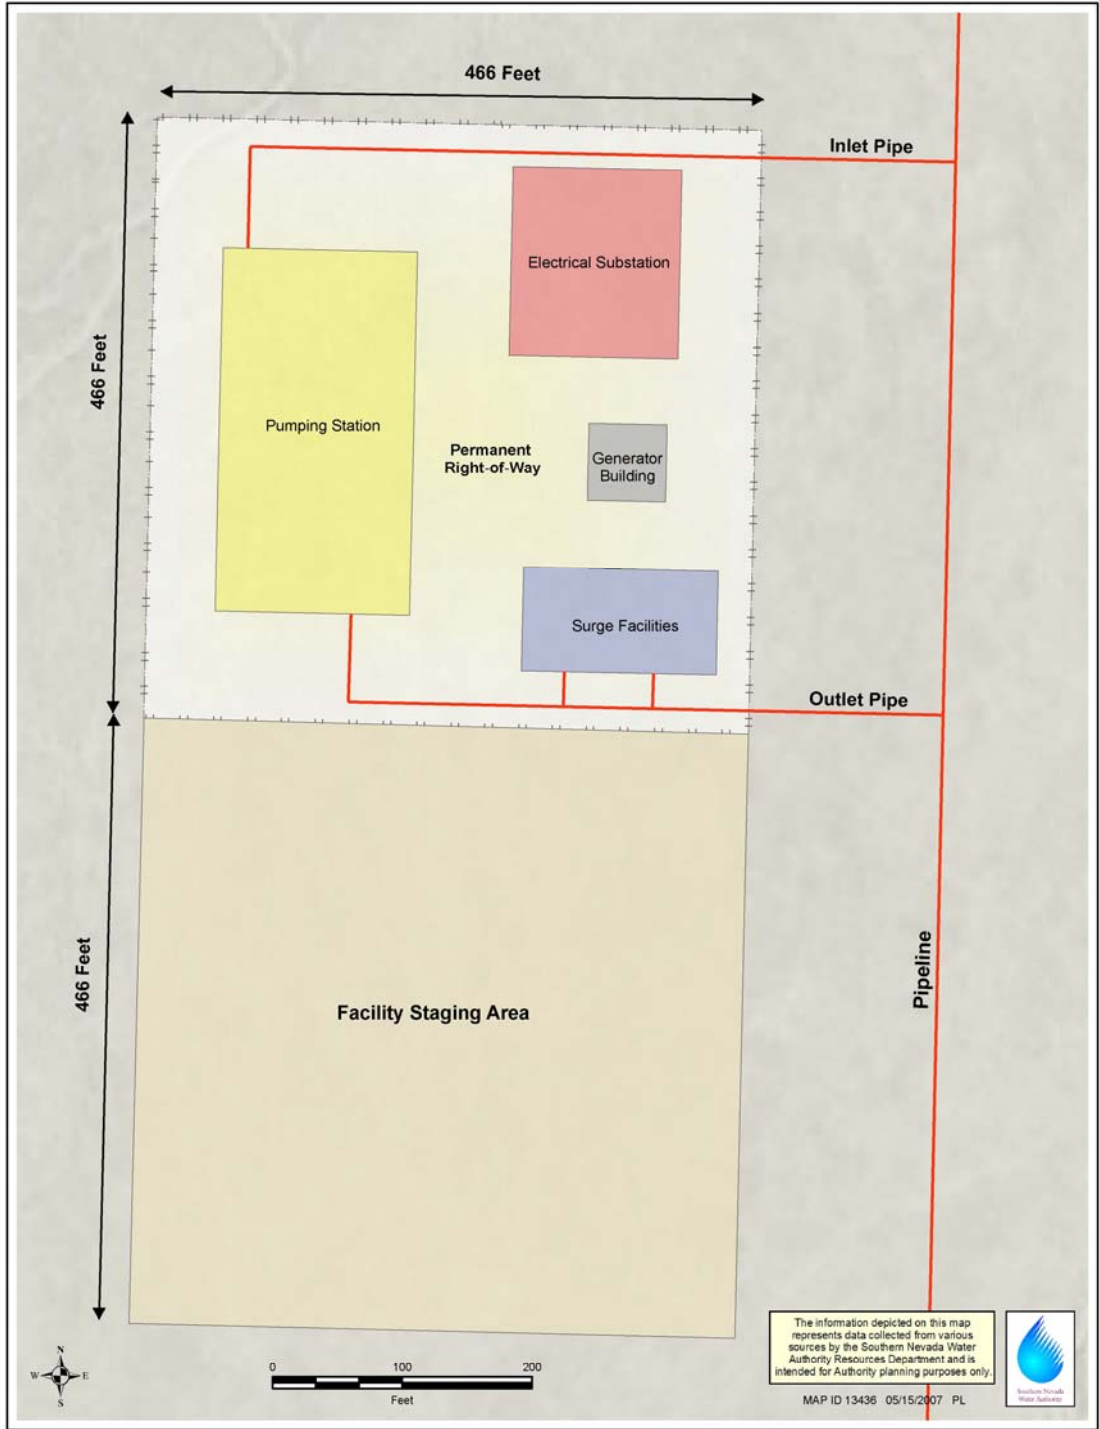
Preliminary Snake Valley North Pumping Station Site Plan
